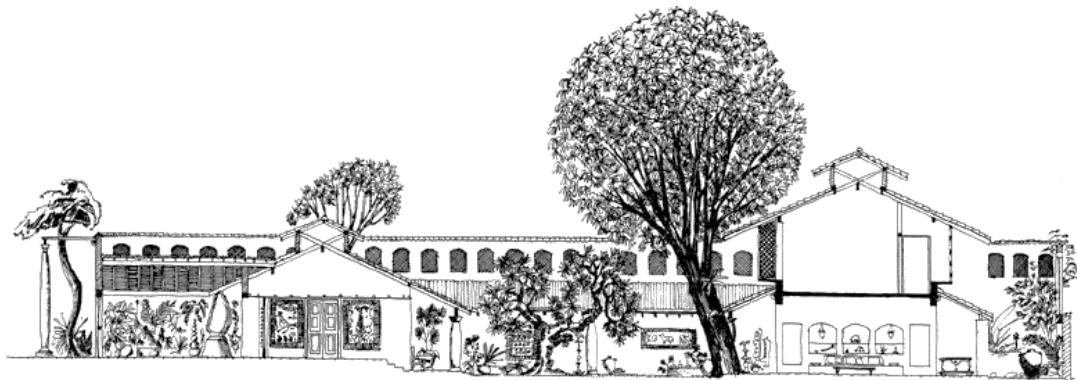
House for Osmund and Ena de Silva Elevation Plan
